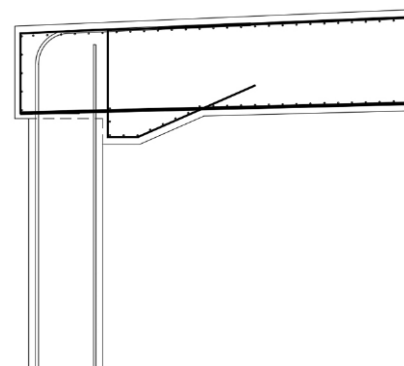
Example of reinforcement connection between d-wall and top slab of a tunnel [3]
